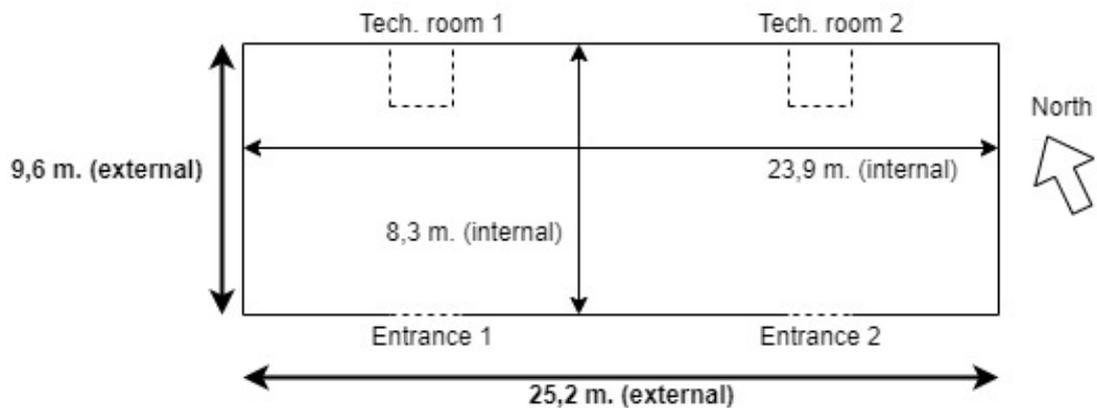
First floor - Building definitions after renovation, internal, and external measures are shown. The bolded lines and texts are external measures.
